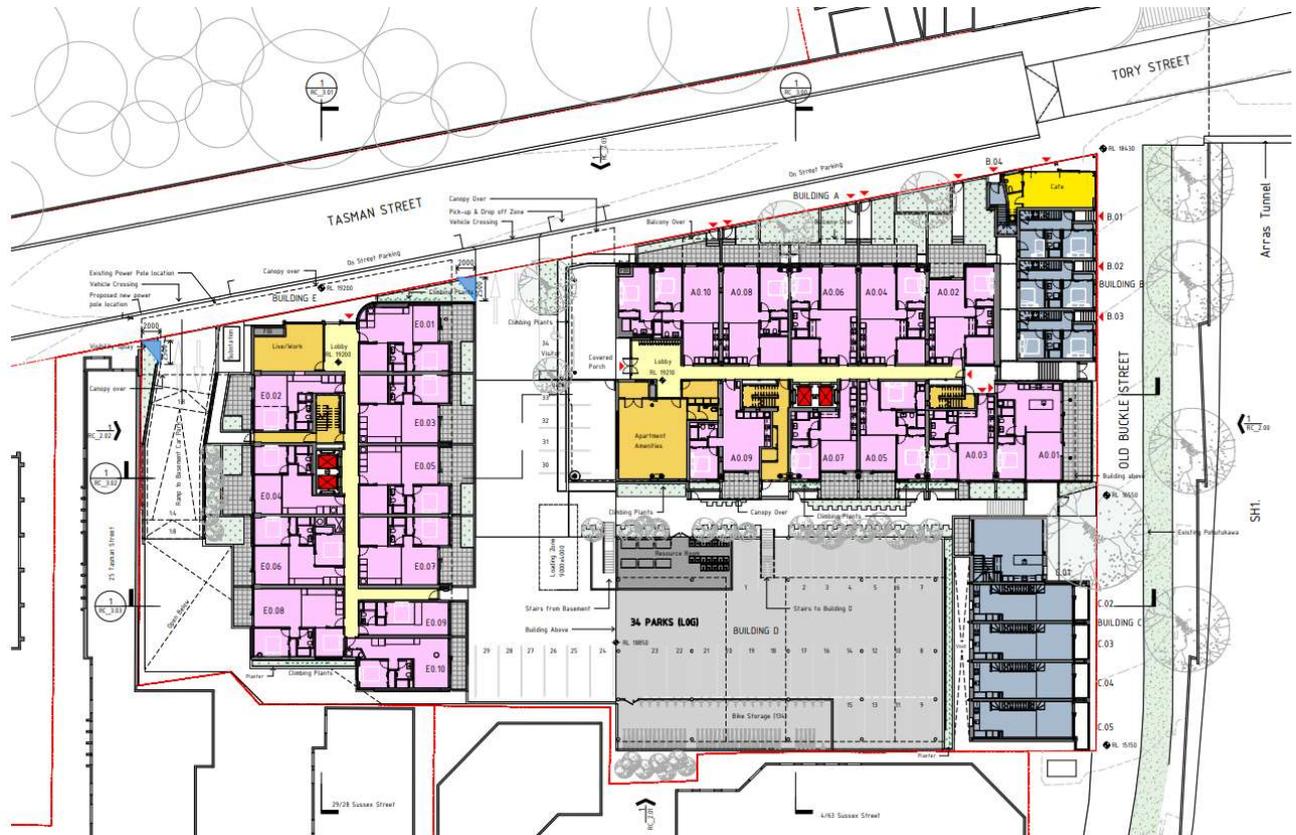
Architect's ground floor plan (received from Athfield Architects, 20 December 2022)
